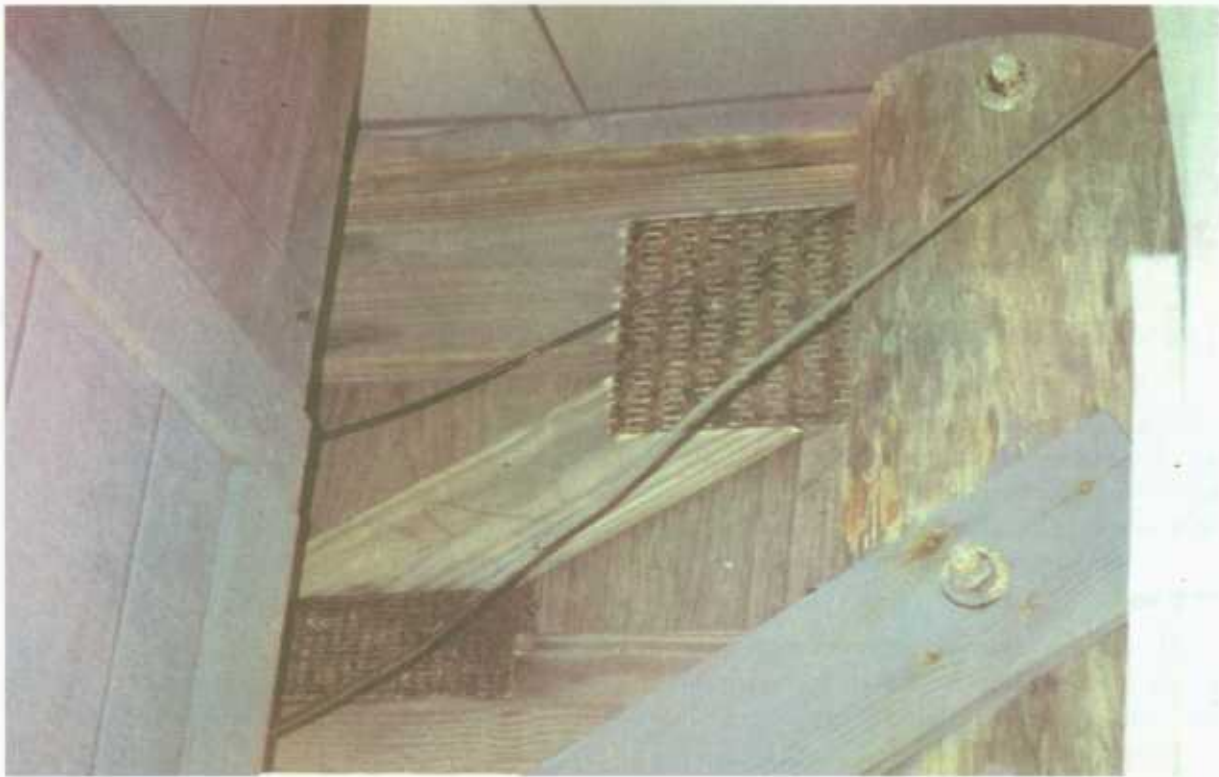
Corrosion of galvanized floor truss plates was observed in many buildings.
